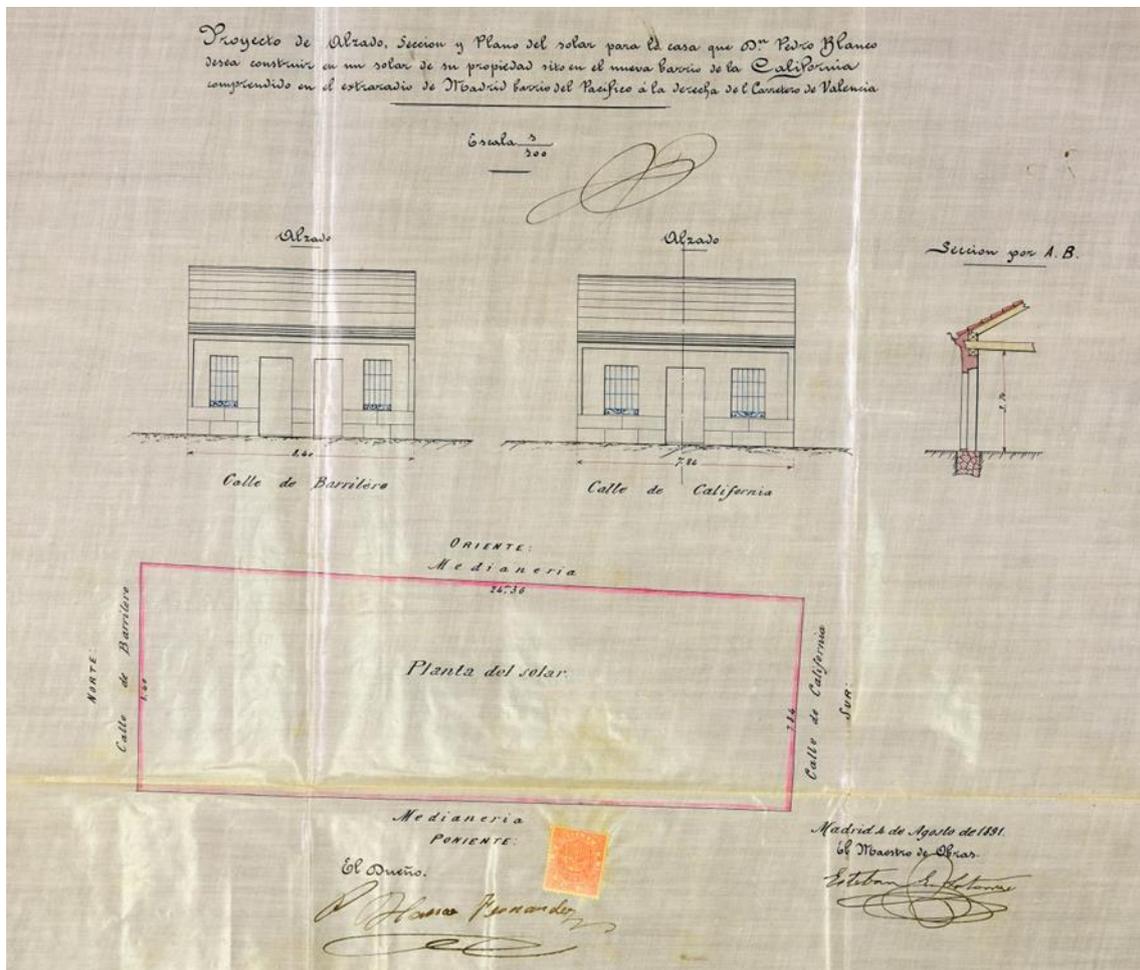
First building permit on Seco Street. The small house, signed by a maestro de obras, did not detail the interior distribution.
